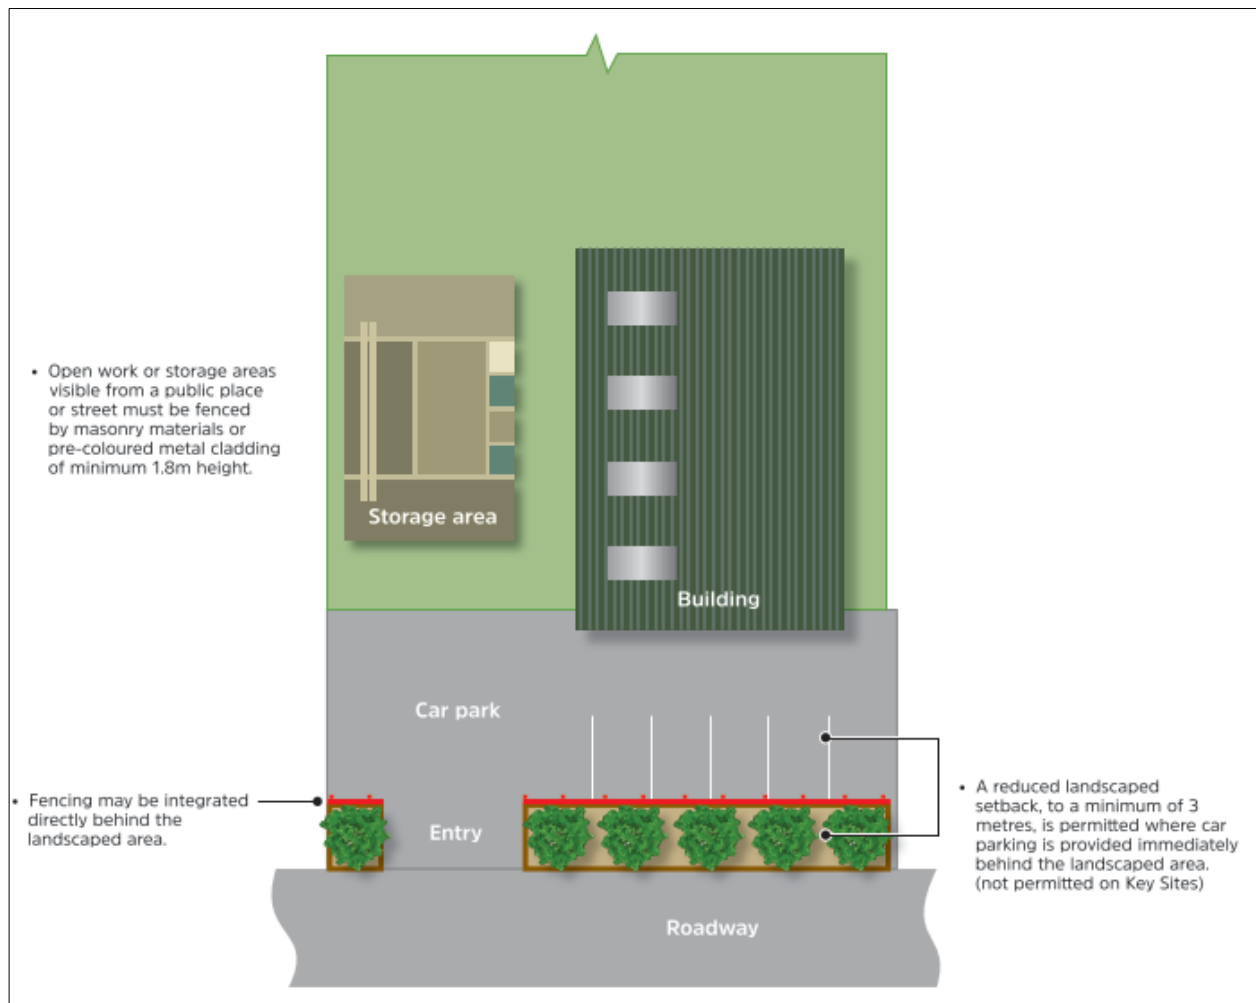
Typical Site Layout - All Sites other than Ring Road or Goddard Lane
